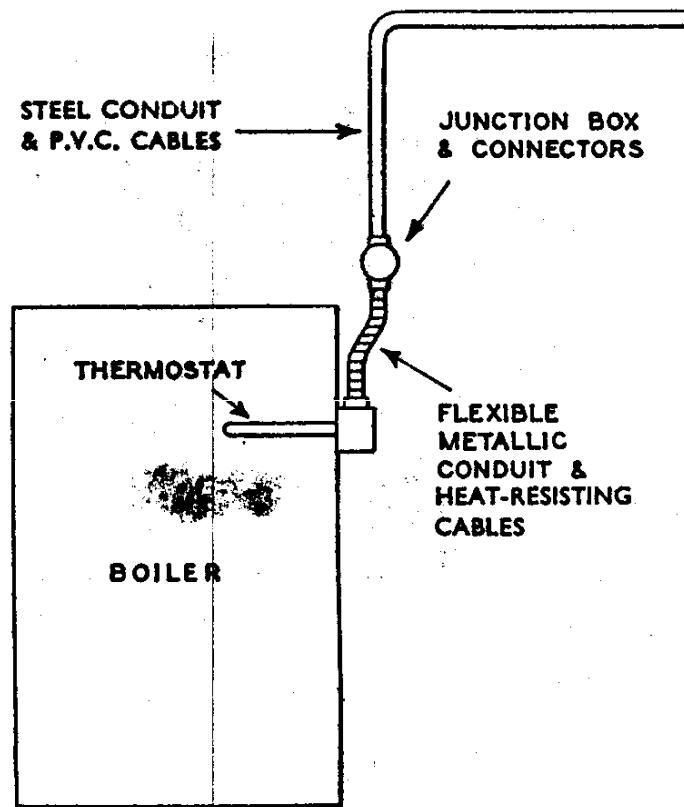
A method of wiring cable-feed to boiler thermostat
